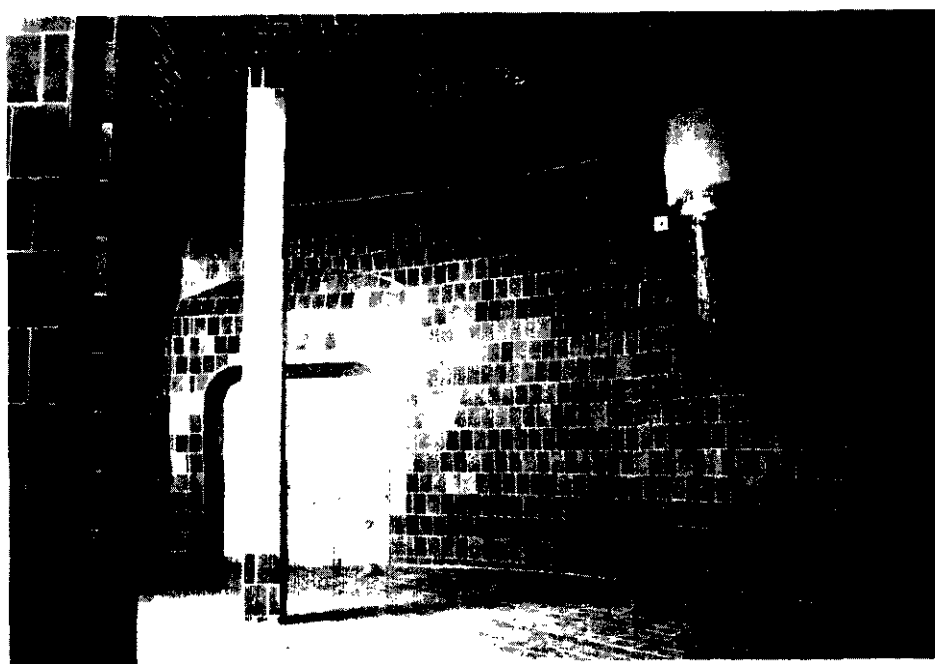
Completed Reinforced Concrete/Tile Constructed Tank.
